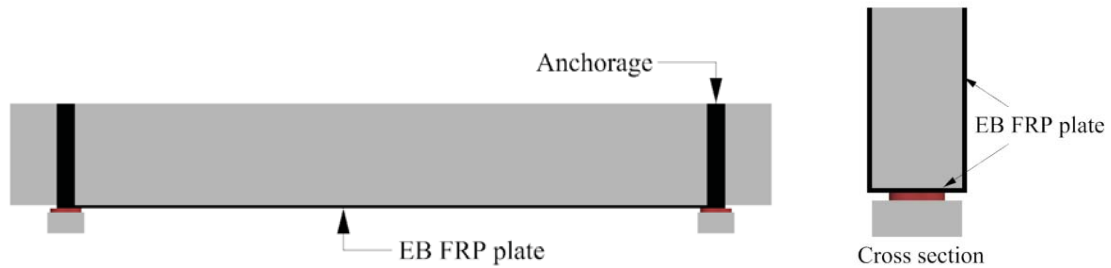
Typical EB FRP strengthening system for concrete beams
